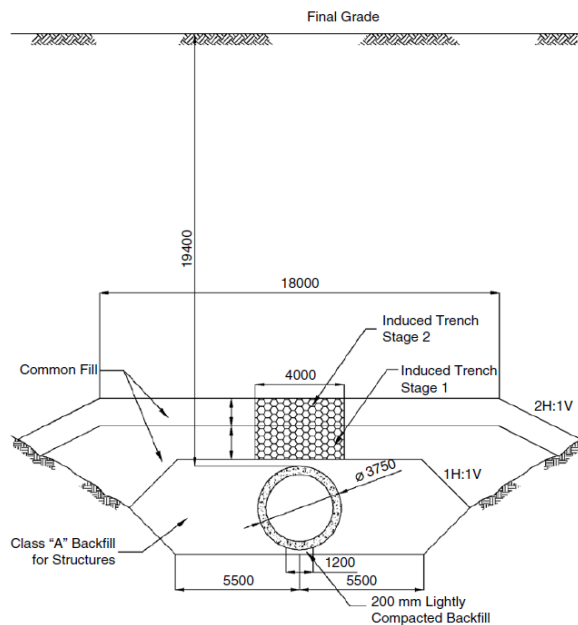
Installation of the imperfect trench application (Parker et al., 2008)
